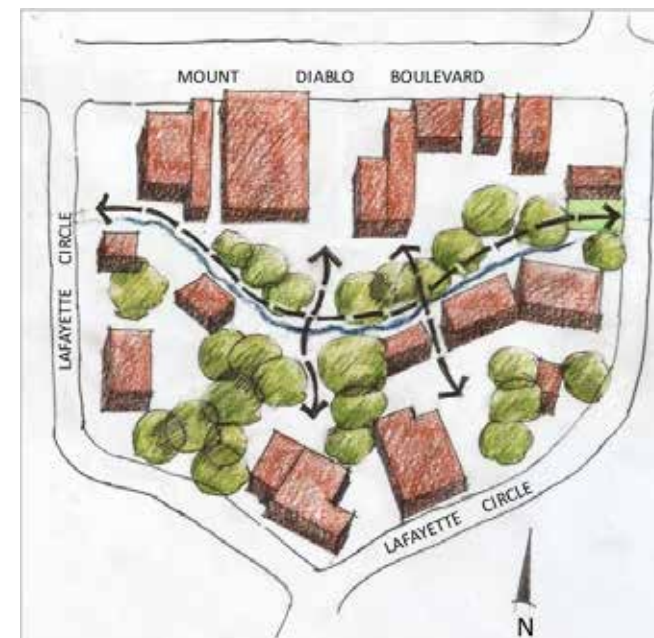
Downtown Specific Plan Shield Block plan showing Creek Trail and Crossings
